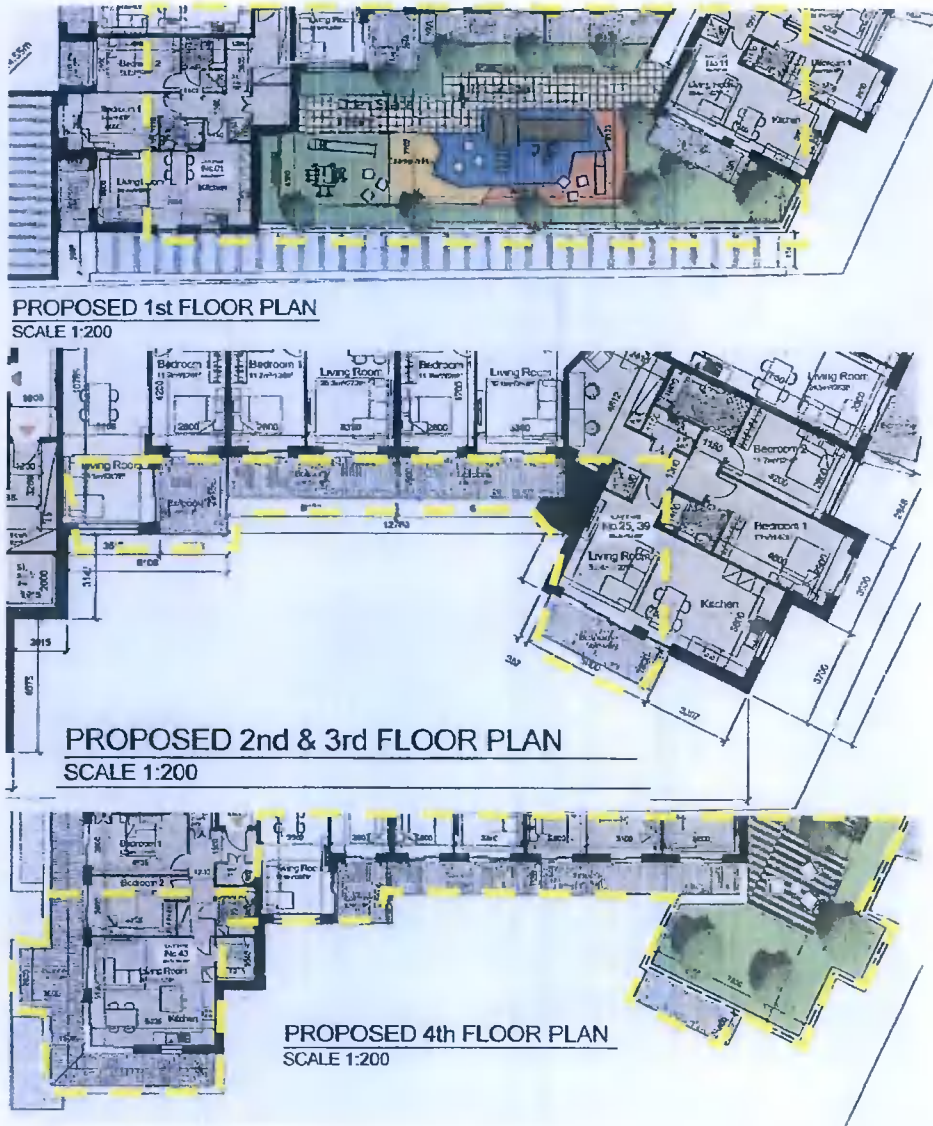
Scheme's Elevation 3 floor plans - overlooking windows, balconies & roof terrace storeys 2 to 5
